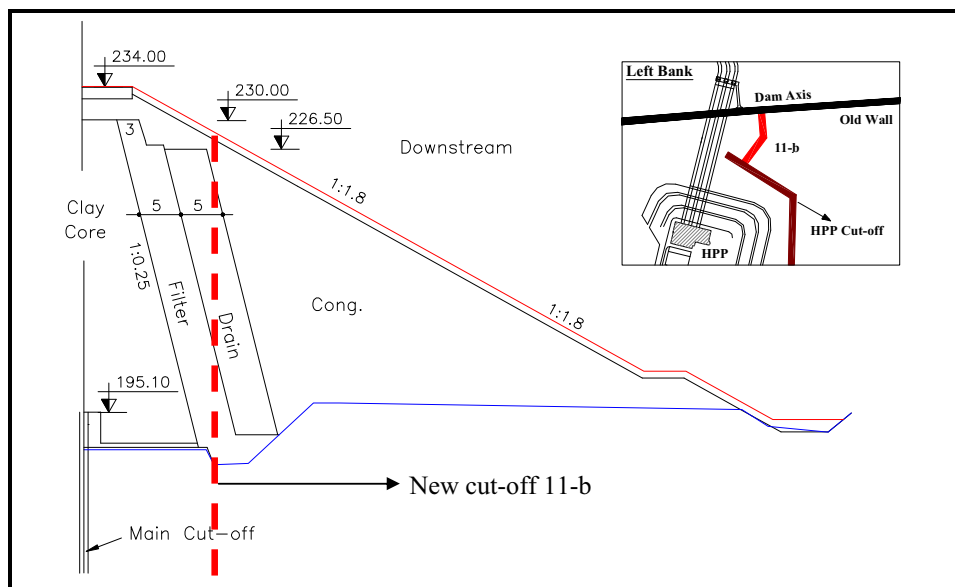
A cross section of the Karkheh dam body at the location of the powerhouse connection cut-off wall (cut-off entitled 11-b in Fig.1)
